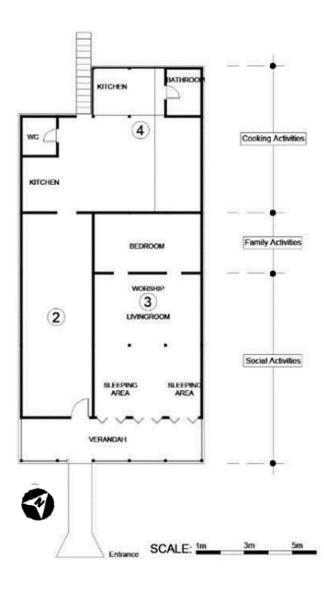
Cham Plan first floor. Source: Pham, 2018
